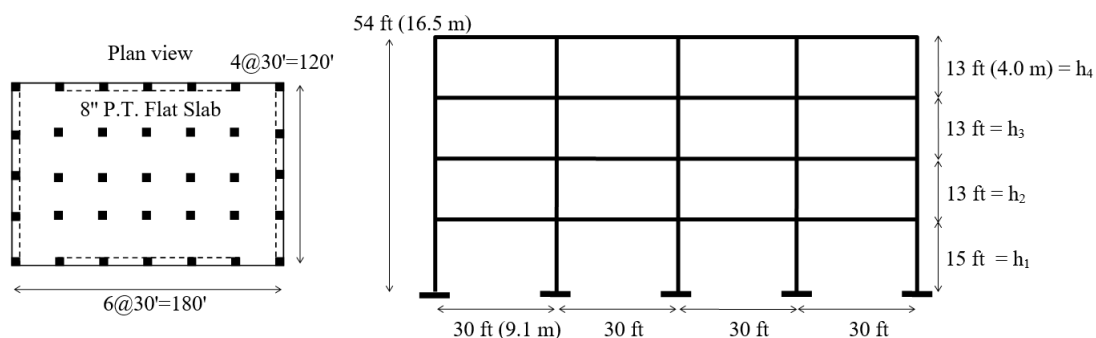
Plan view of the 4-story reinforced concrete building and elevation of the perimeter moment resisting frame (adopted from Aschheim et al. [15])
